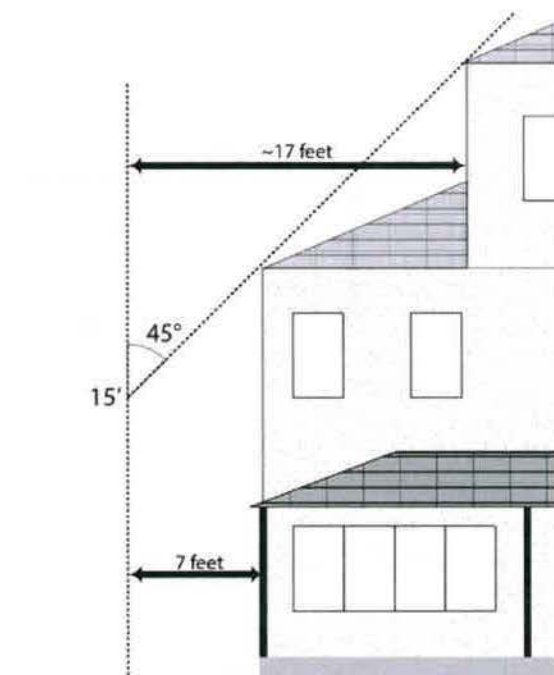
Two-story structure built in-line at a 7-foot setback, with a potential 3rd story.
